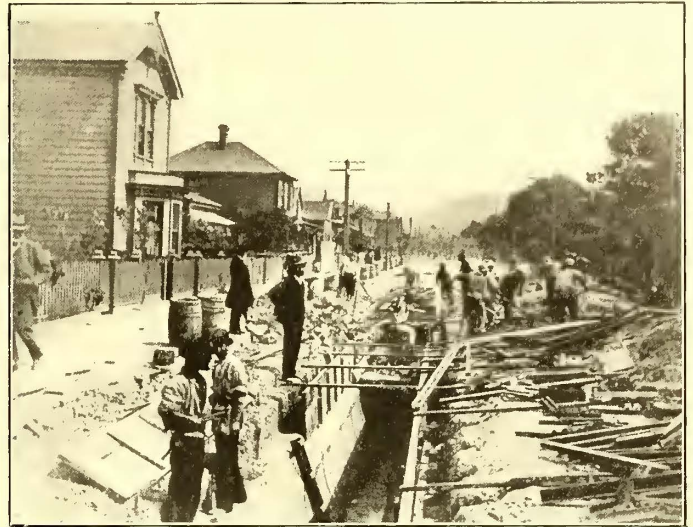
LAYING THE TOP OF THE KENT TERRACE CULVERT
